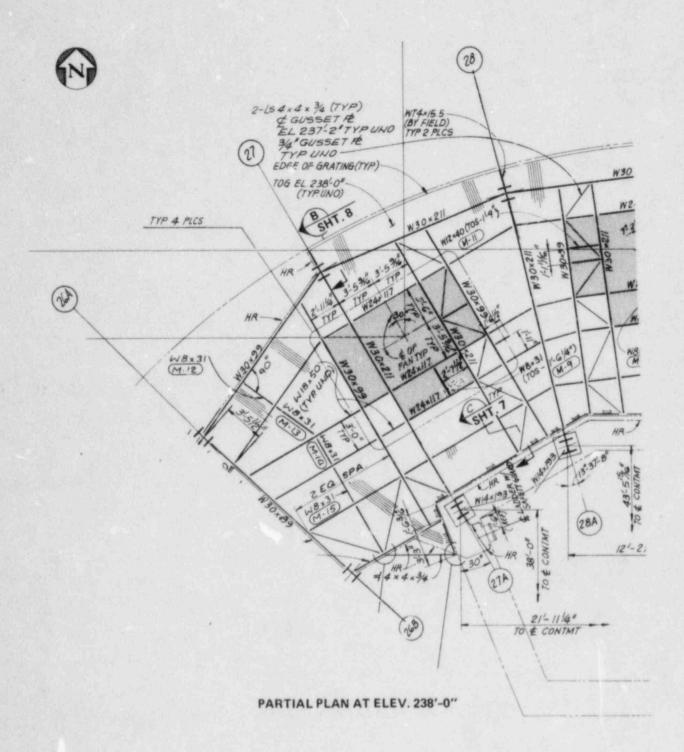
STRUCTURAL STEEL DESIGN DETAILS (Sheet 3 of 9)
